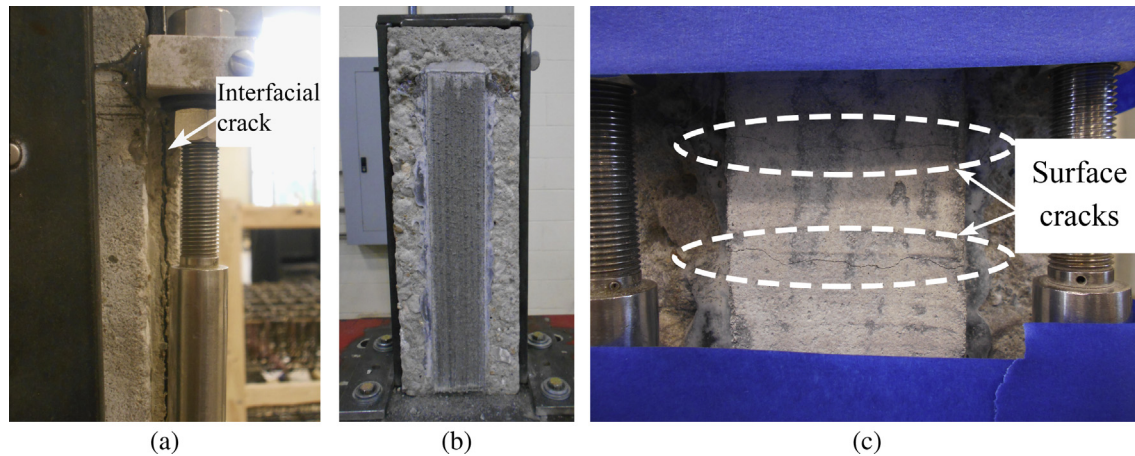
Photos of single-lap shear test specimens: (a) crack along interface of cords and matrix, (b) surface of internal matrix layer after failure (specimen DS_K_330_50_1 shown), and (c) cracking observed on surface of external matrix layer.
